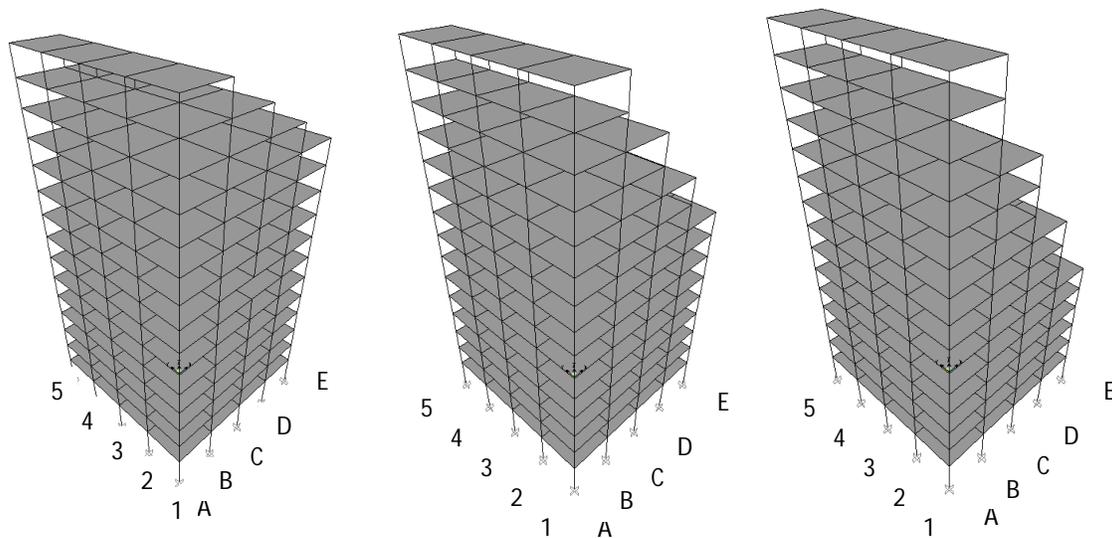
3-D models of stepped buildings with steps having 1, 2 and 3 floor heights
